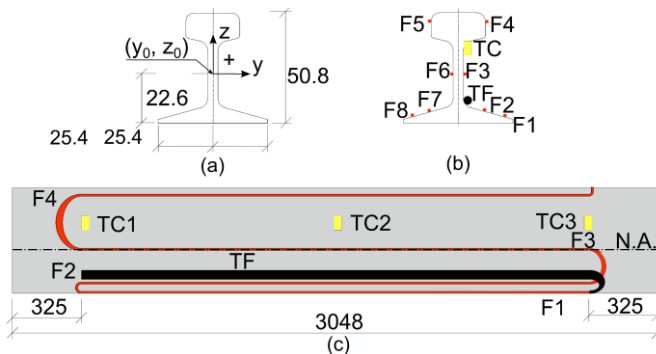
Lab buckling test specimen (in mm). (a) rail cross-section dimensions, (b) fibre locations on cross-section, (c) longitudinal dimensions and fibre layout.
